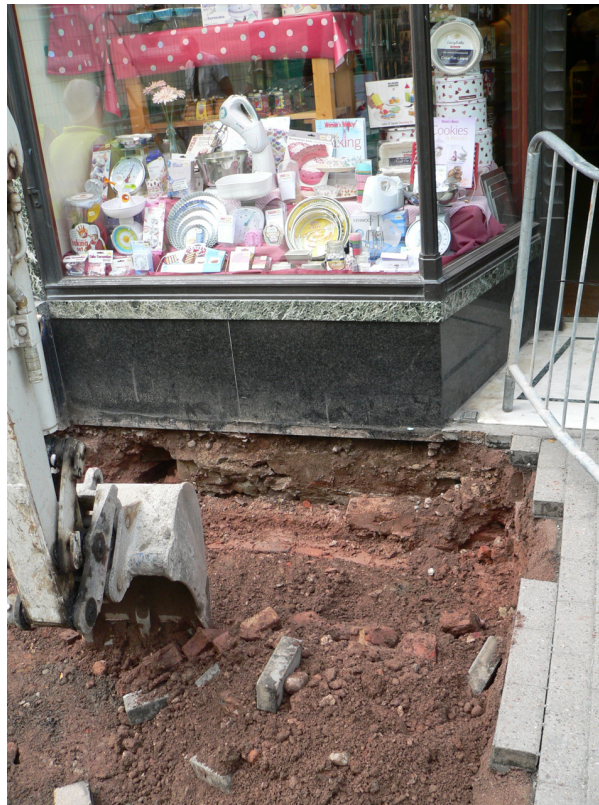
Excavation outside 43 Widemarsh St ('Cookmate') showing foundations
